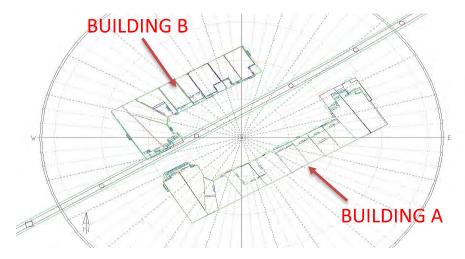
PLAN VIEW OF THE BUILDINGS & VIADUCT
